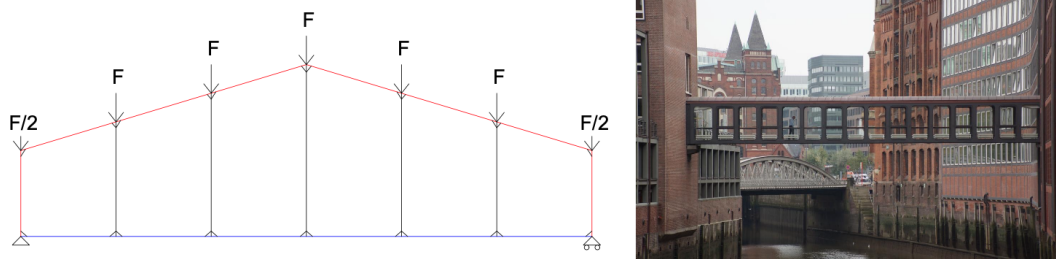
Viereendeel truss scheme and application example: AMERON Hotel Speicherstadt footbridge
